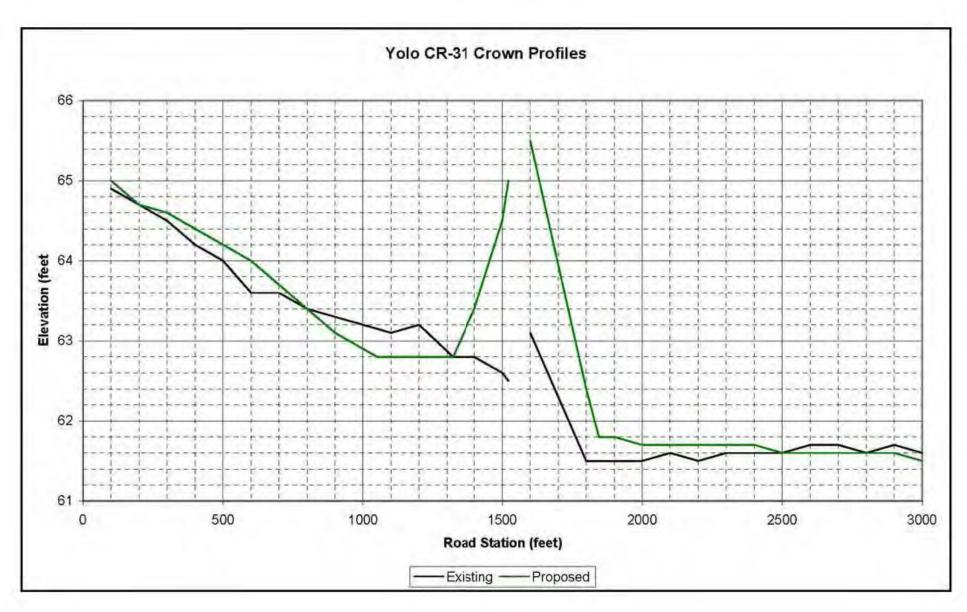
Existing and Proposed Condition Road Crown Profile, County Road 31
